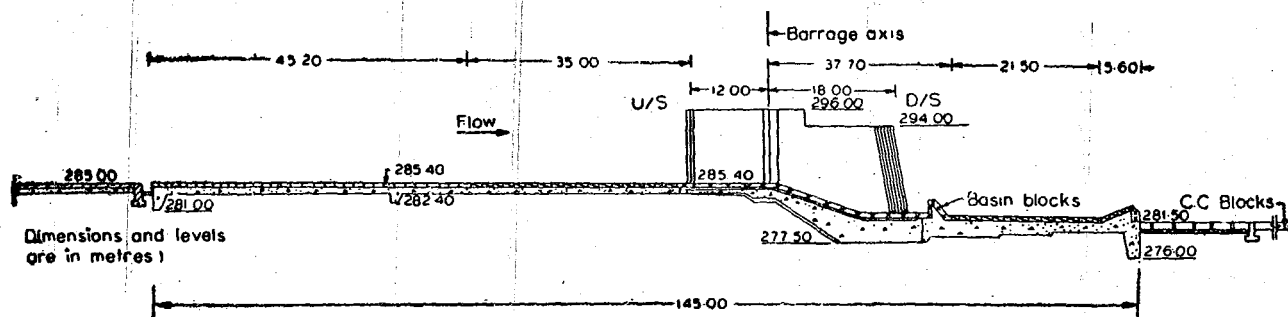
(c). Section through undersluice bays of New Bhimgoda Barrage.
